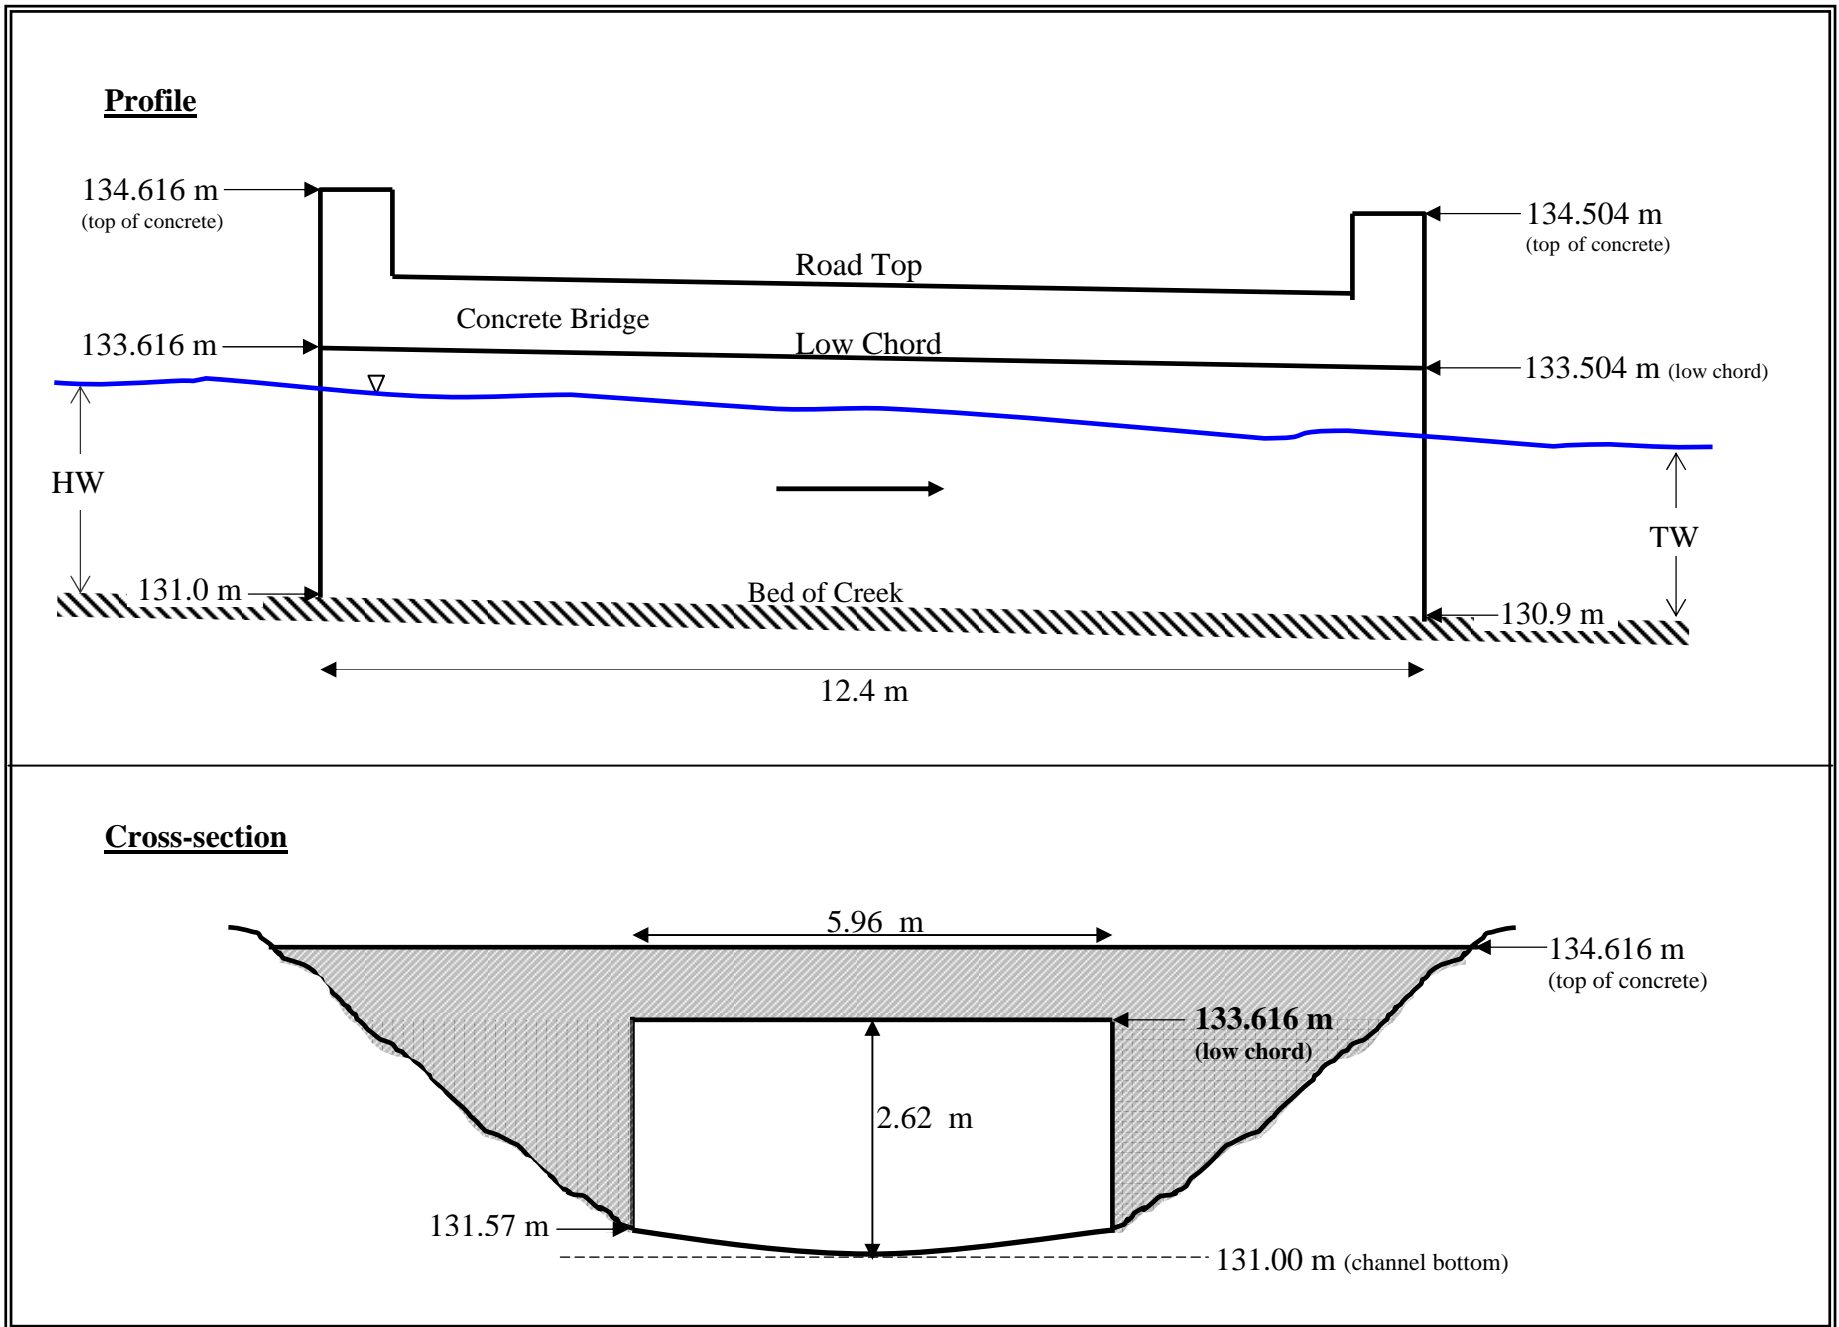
Bridge under Rideau Ferry Road (Otty Lake Outlet)
